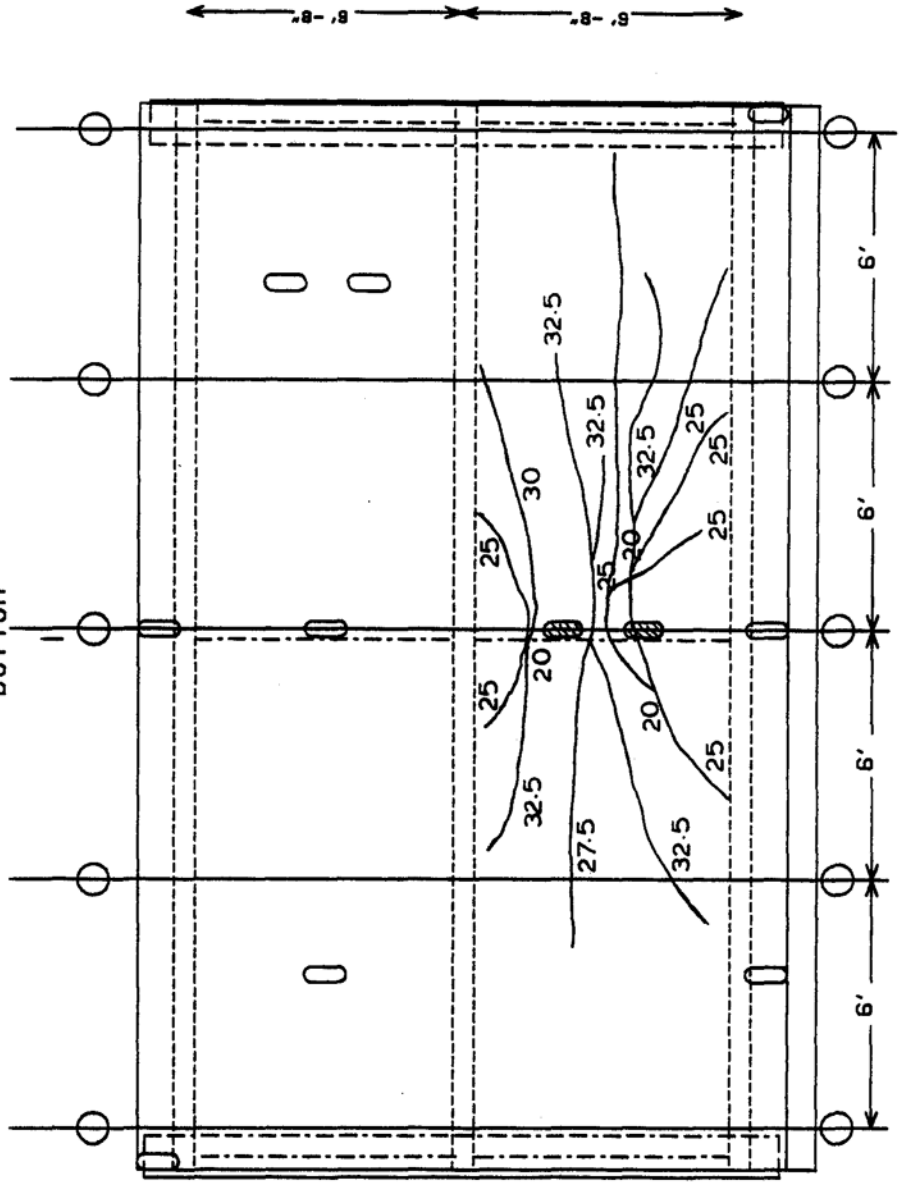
Bottom Cracking Pattern (First Bridge - Test No. 4)
